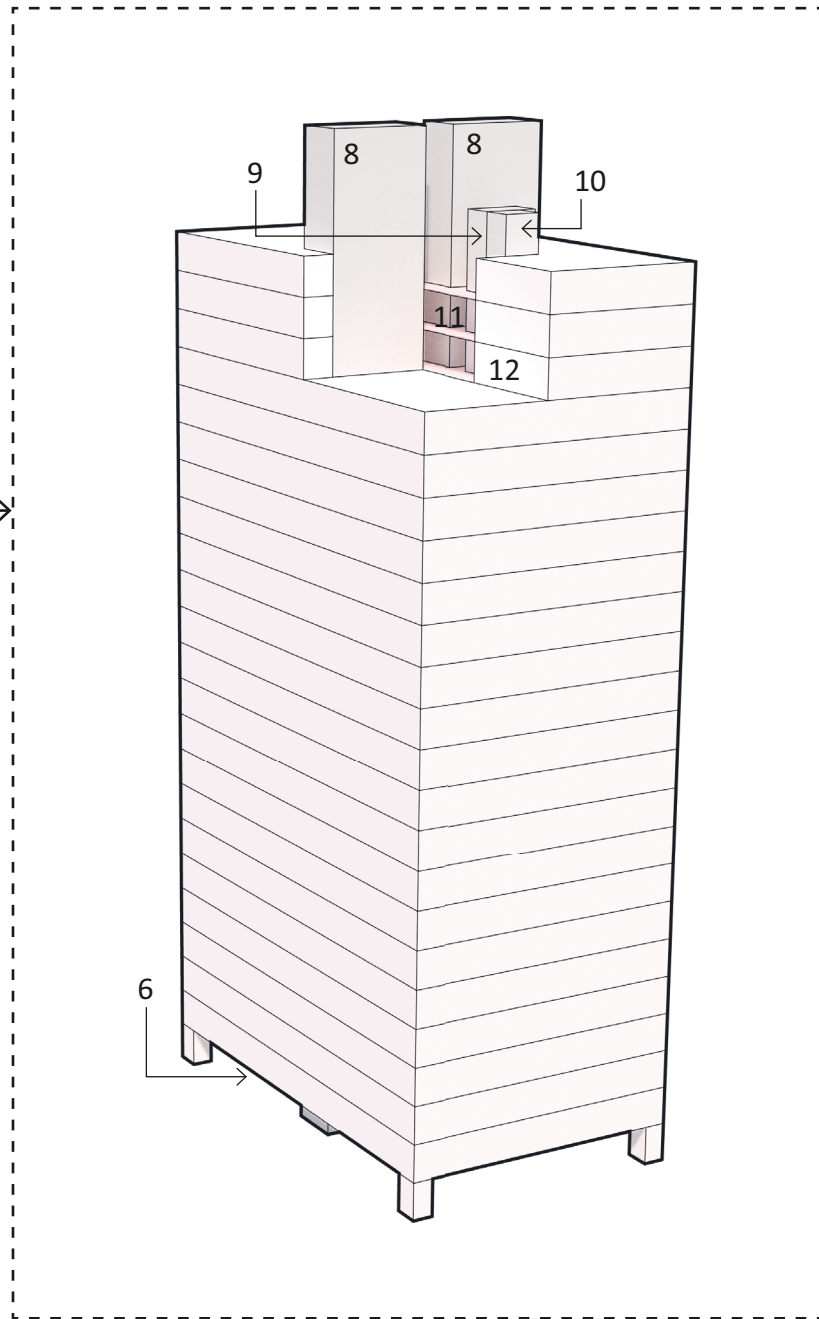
Case study of Wadhwa Apartments Mumbai for typical tower elements
